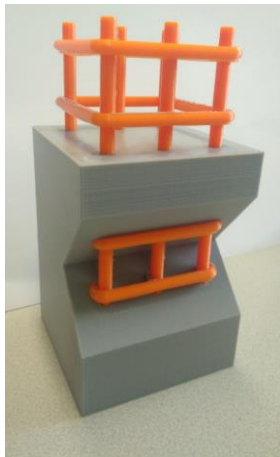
3D model of a reinforced concrete structure printed with a combination of filaments of different colors: concrete and reinforcement bars have been printed in grey and orange, respectively.
